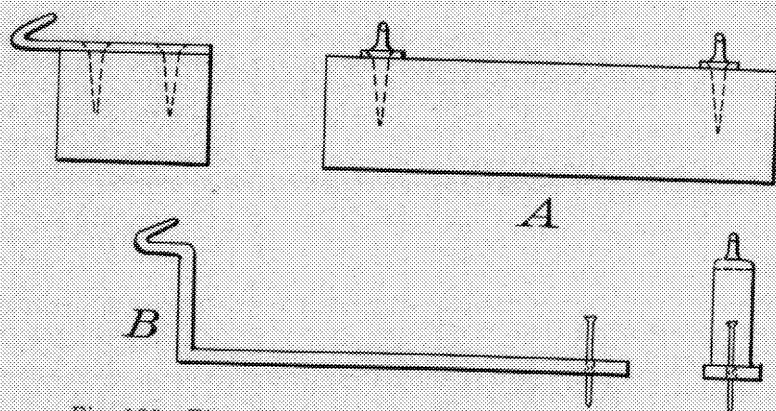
Floor Hooks Used in Laying Out Tower Tiles.
